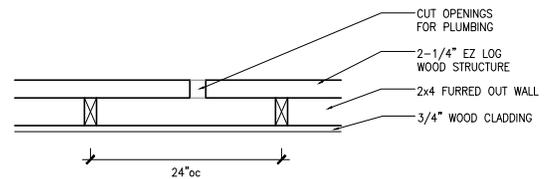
EZ Log AF2.0 interior furred out wet wall detail
